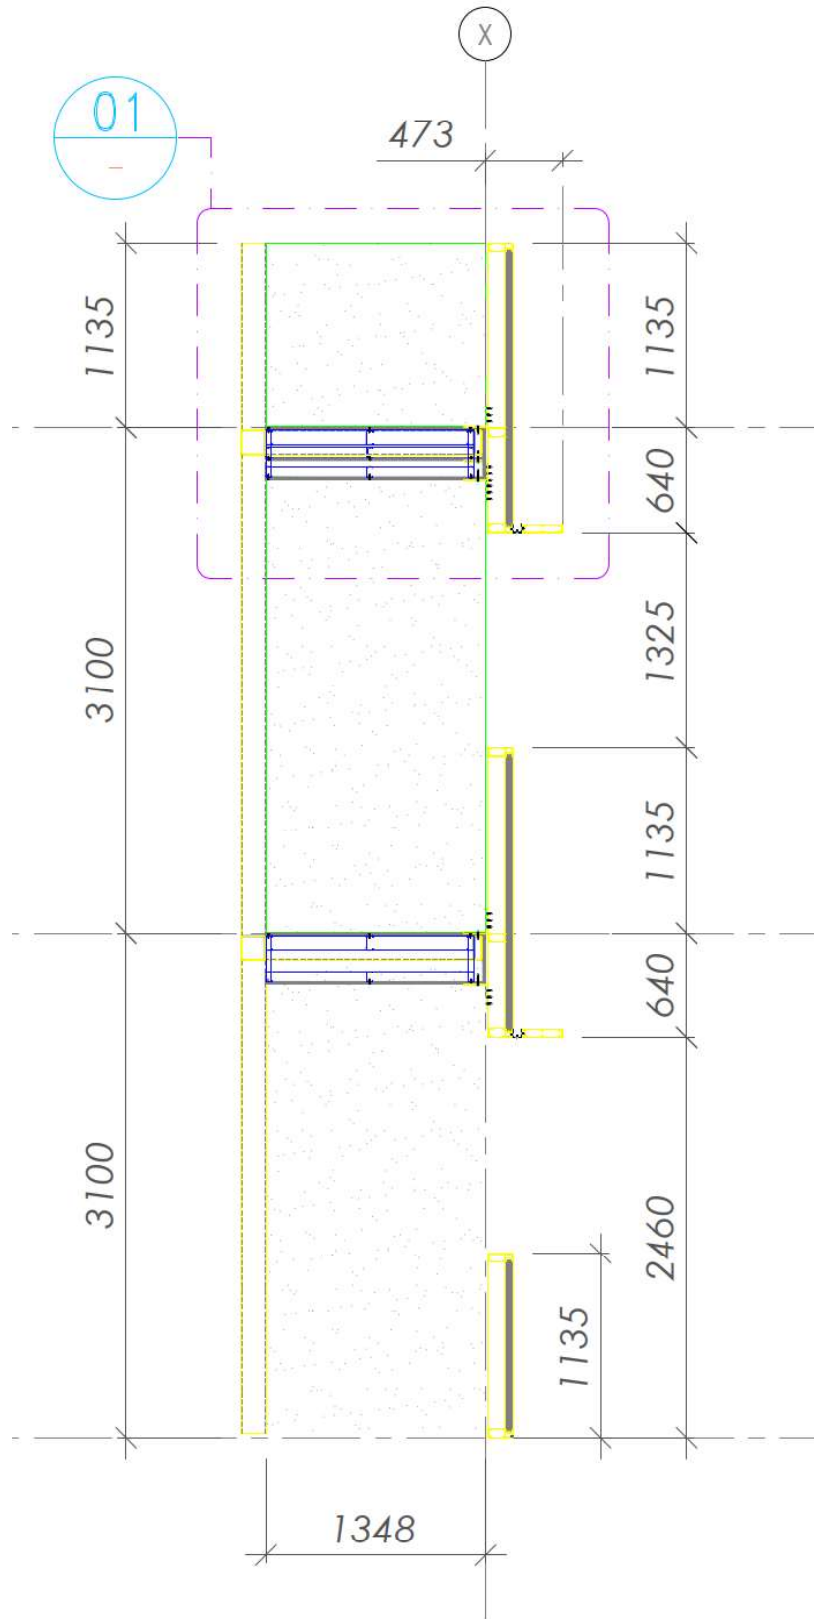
Elevation view of the wing wall – MgO board wall section -balustrade dimensions
